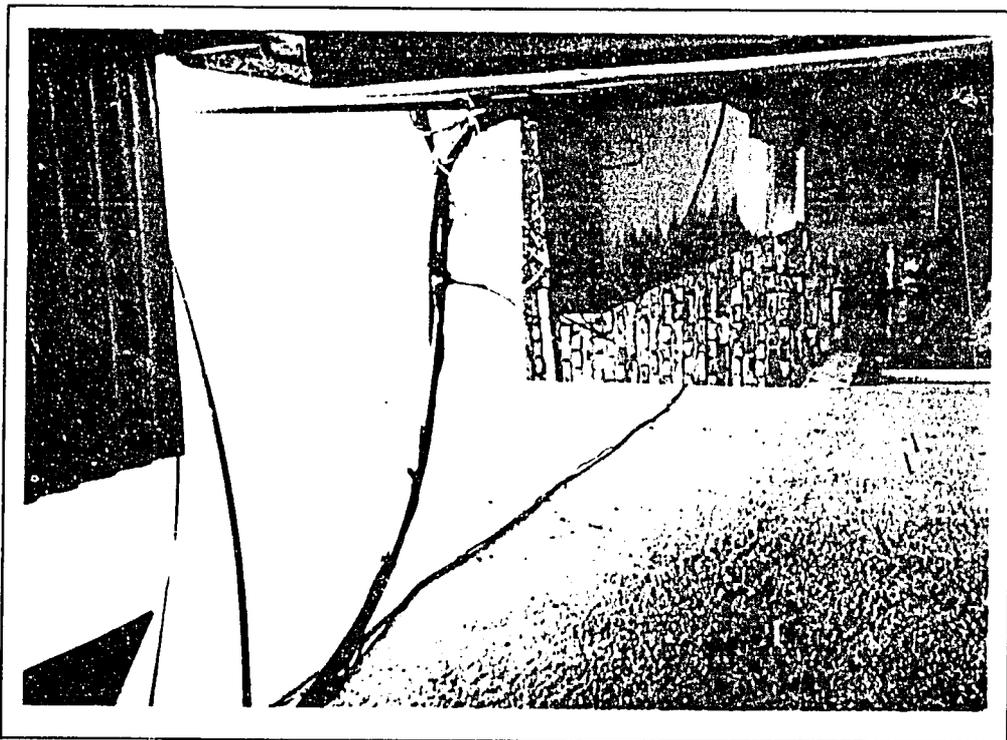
Peshawar MSH Office Facility. Southwest corner. Cable crossover to Field Operations building.
